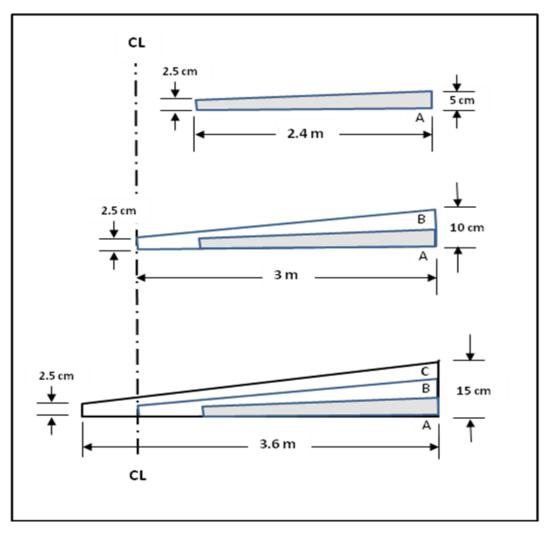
Building up Super- Elevated Curves with Asphalt Mix
